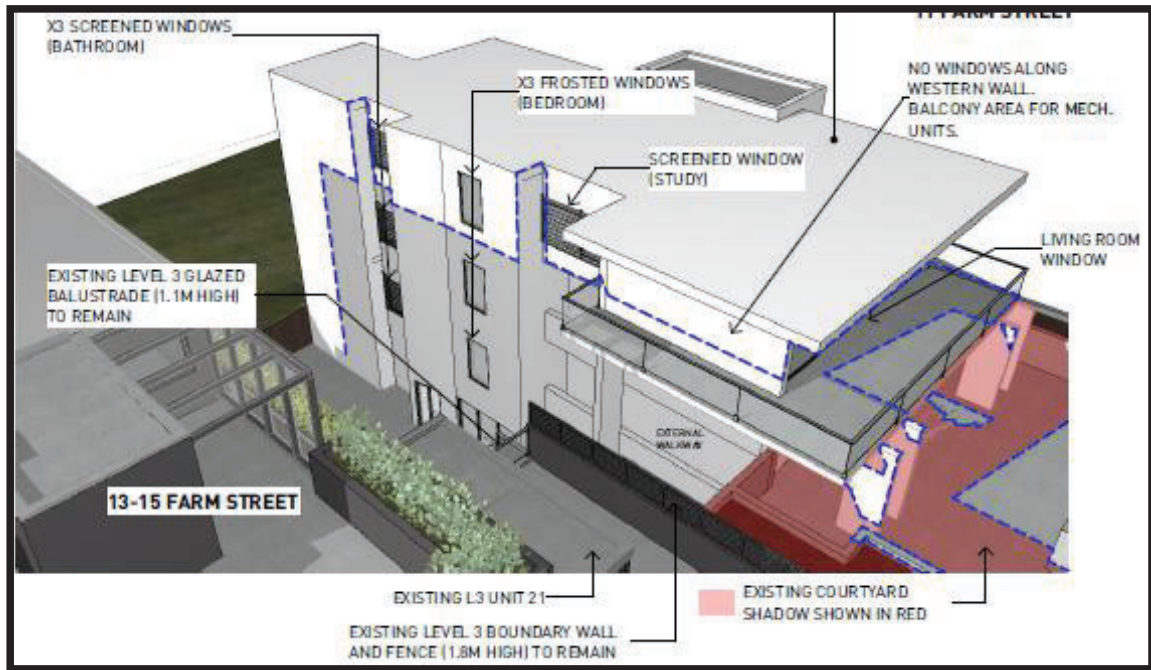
Existing overshadowing onto 11 Farm Street at 3pm.
